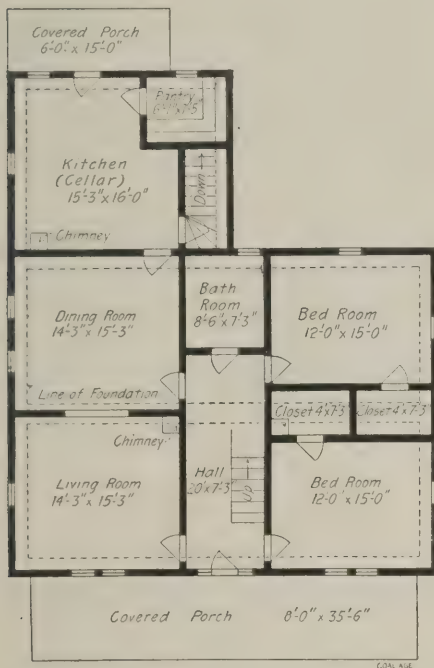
FIRST FLOOR, TWO-STORY HOUSE
